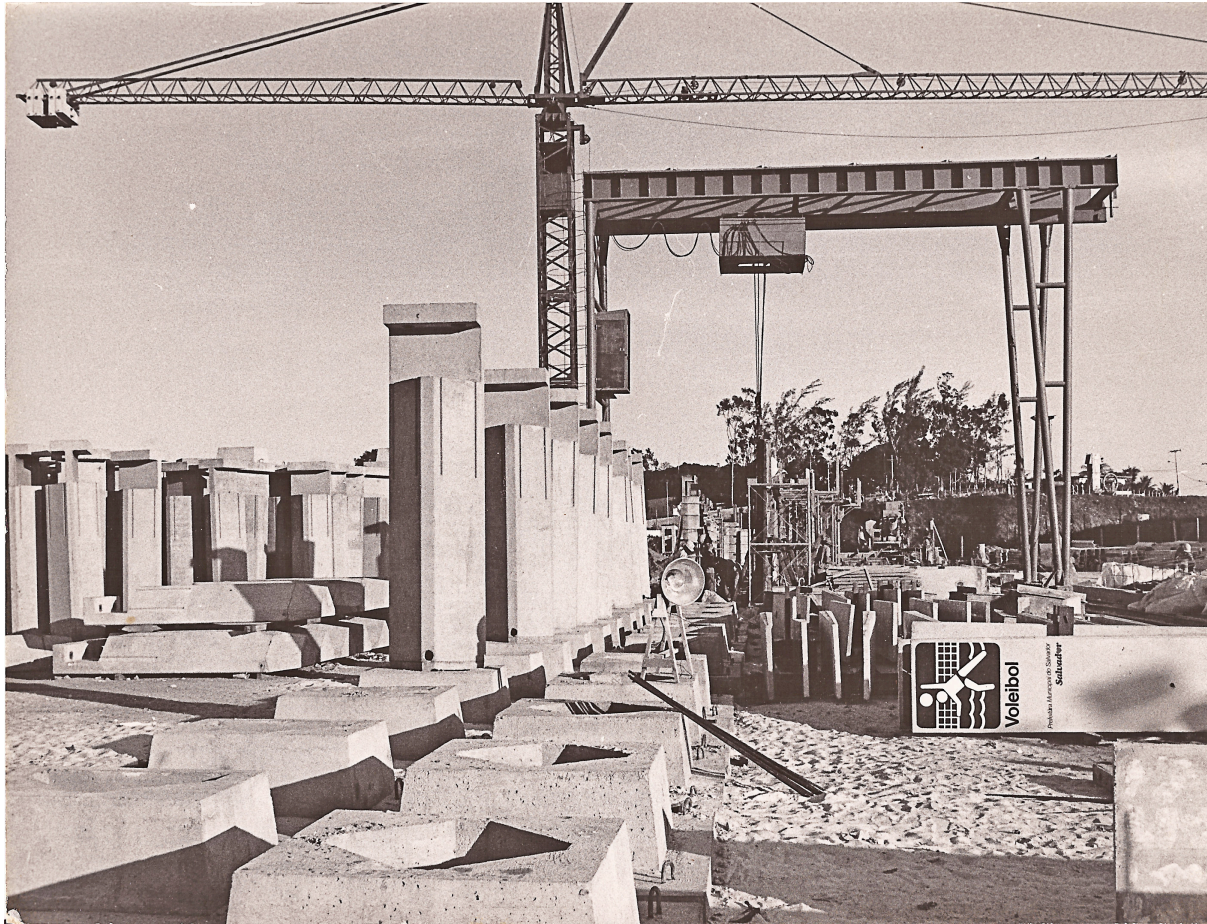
Bus shelter components (footings, column, and roofing) at RENURB's storage yard. Design by João Filgueiras Lima, 1979. Arquivo Kristian Schiel, Brasília
